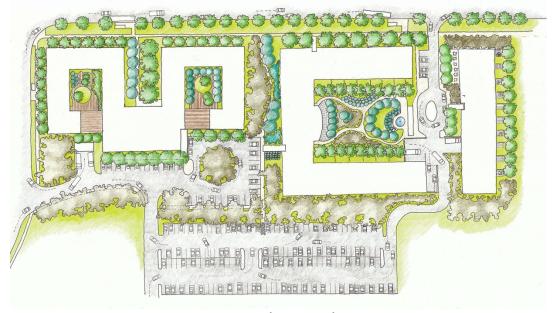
Conceptual Redevelopment Plan (2020 Plan)
